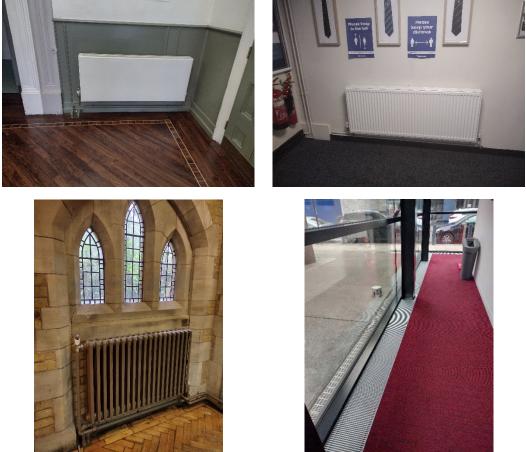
Examples of heating devices in Garrod building, Students Union, Library and Blizard Building
